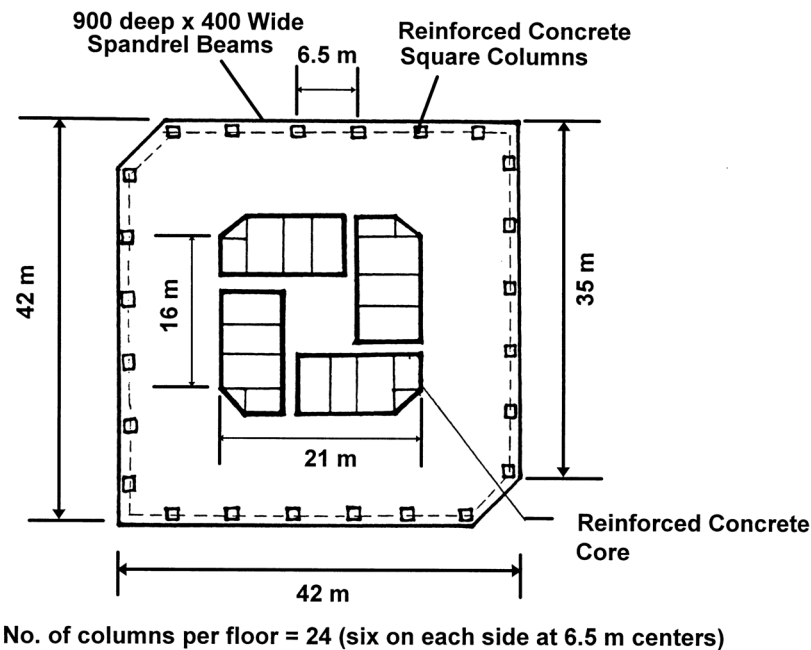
Plan view of the benchmark building (Yang et al., 2004)
